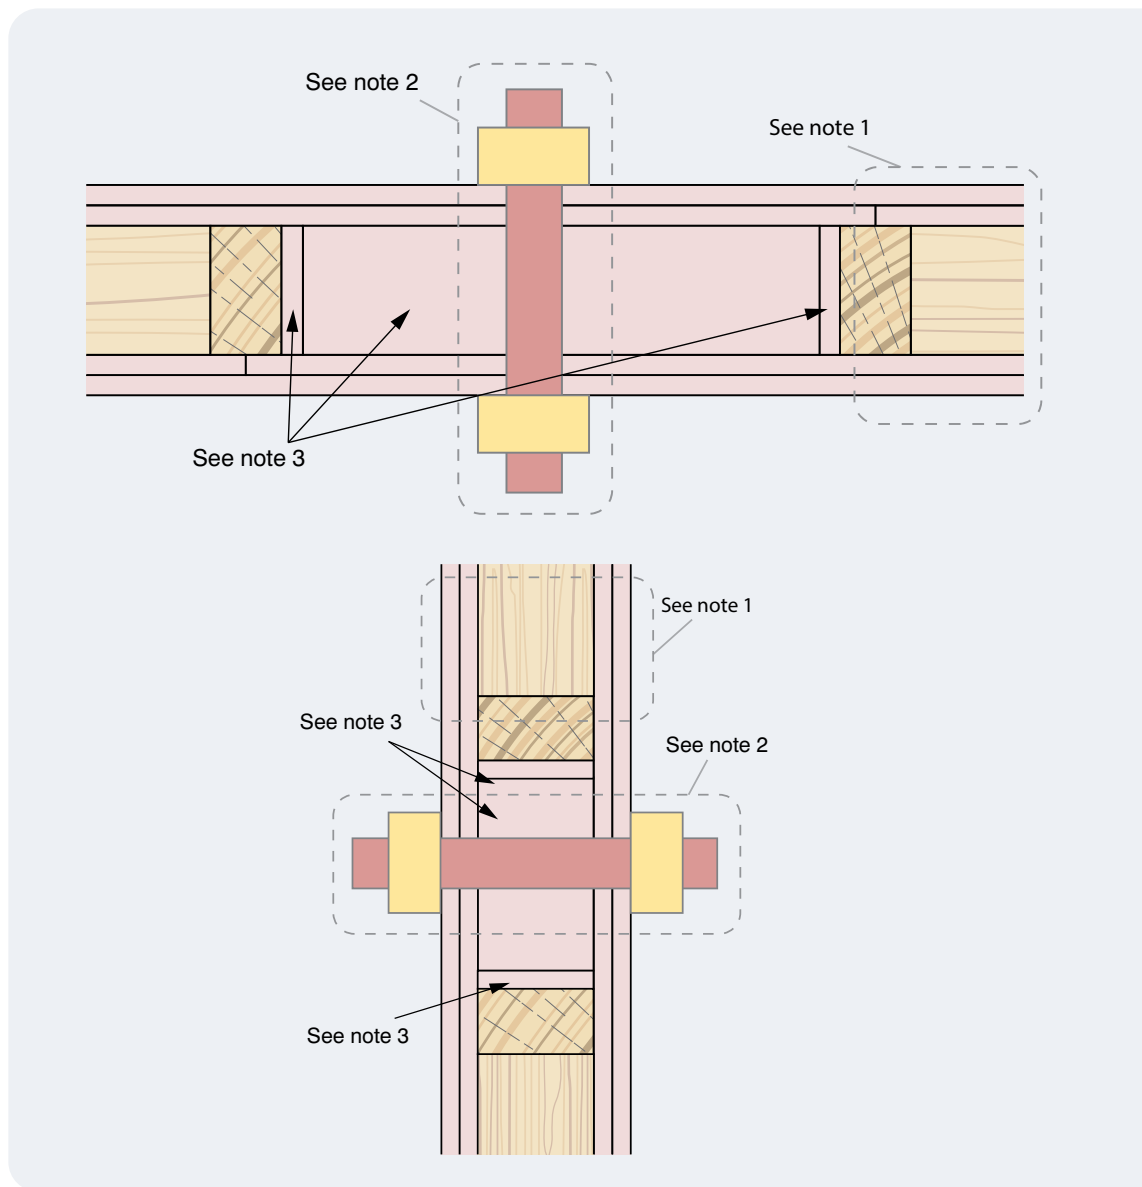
Plastic pipe penetration through fire-protected timber-framed walls with internal linings.
